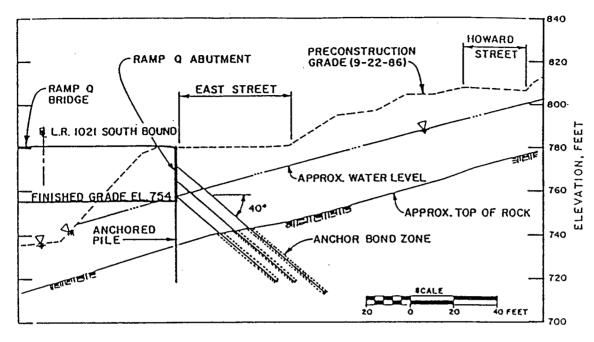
Schematic Cross-Section, Ramp Q Abutment
